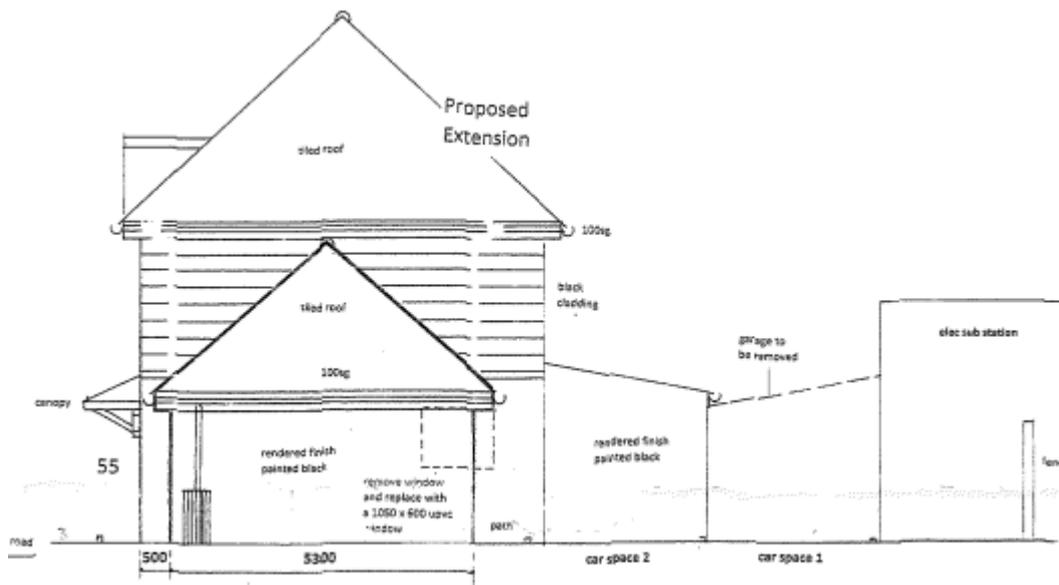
Proposed Side Elevation (Proposed and Existing Floor and Elevations)
